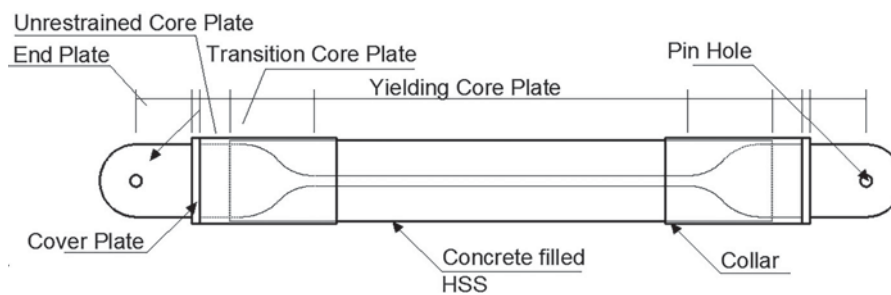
Side view of a typical BRB specimen. HSS = hollow structural section.
